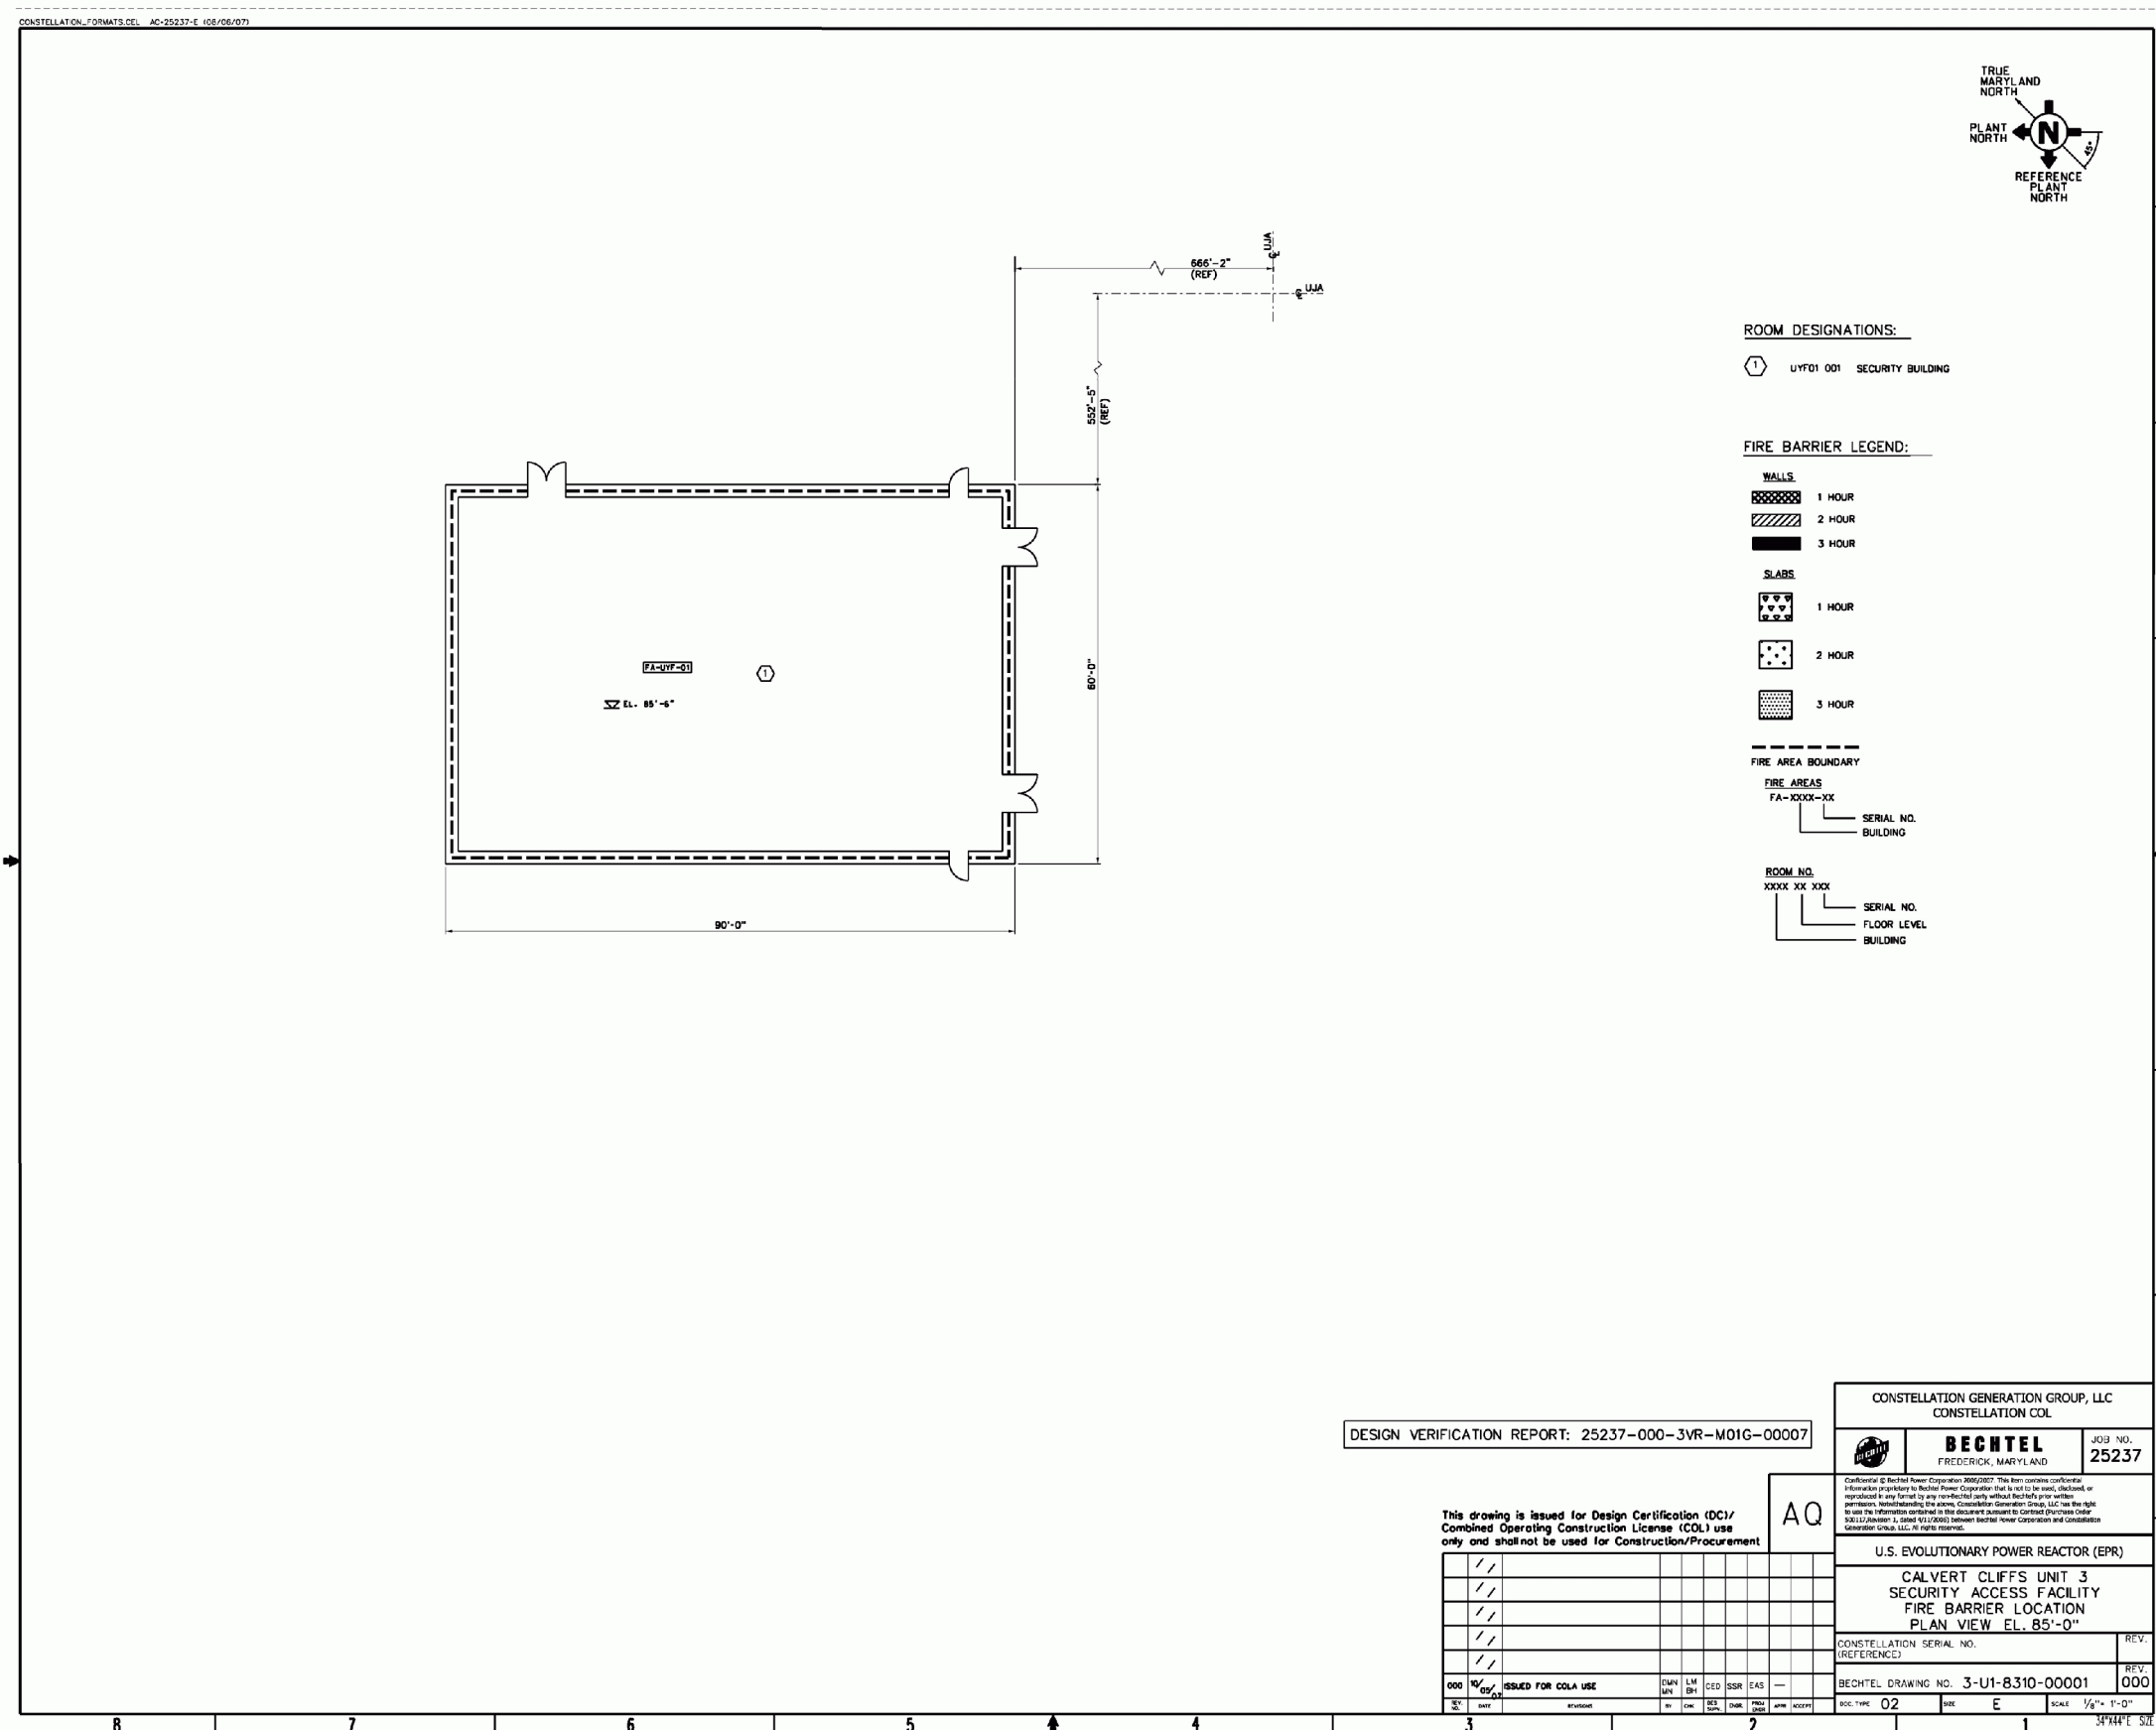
B-17 — CCNPP Unit 3 Fire Barrier Location, Security Access Facility Plan View at Elevation 85'-0"
